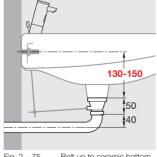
75 Bolt up to ceramic bottom edge 130–150
